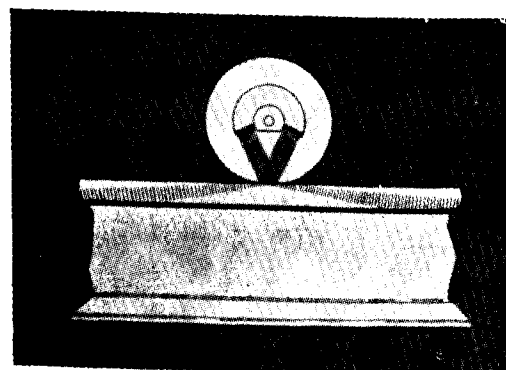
Method of projecting ultrasound into the railhead. Two 2.25 Mc/s crystals set at a test angle of 70° and mounted within the liquid-filled transducer wheel.
